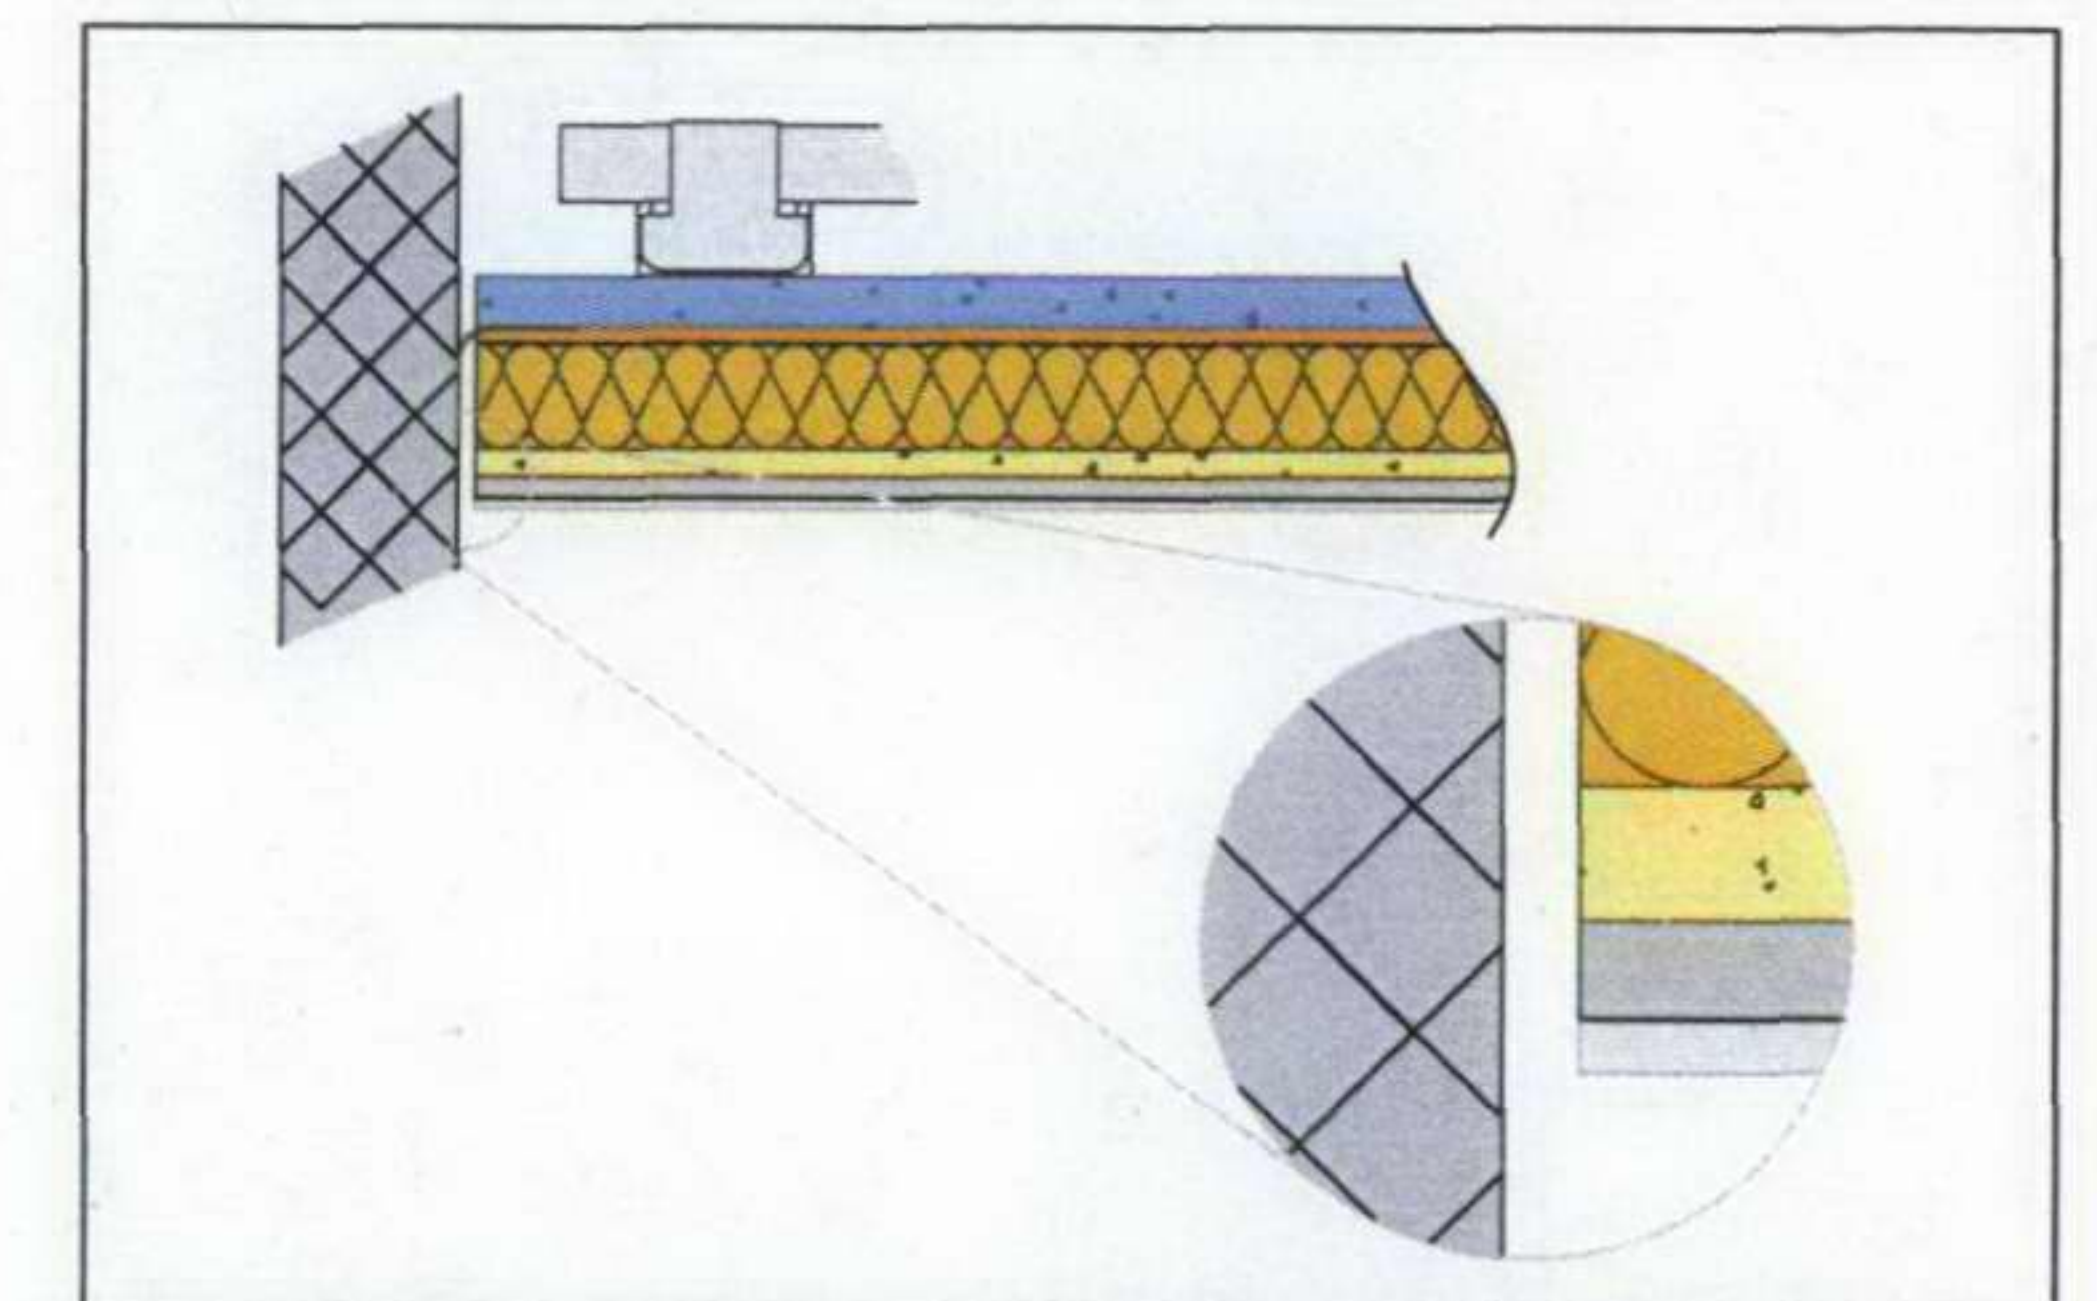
Wall connection with a Swedish cut (see drawing Z003)
